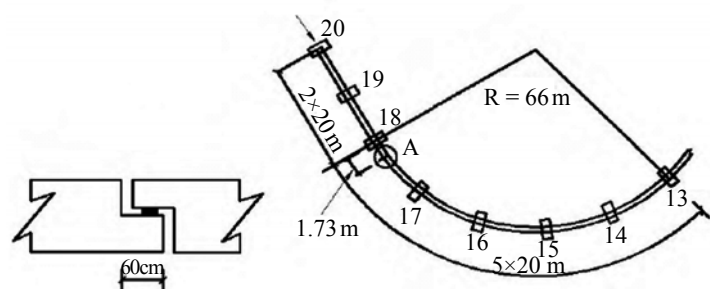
Details of pier top of (Li *et al.*, 2008)
